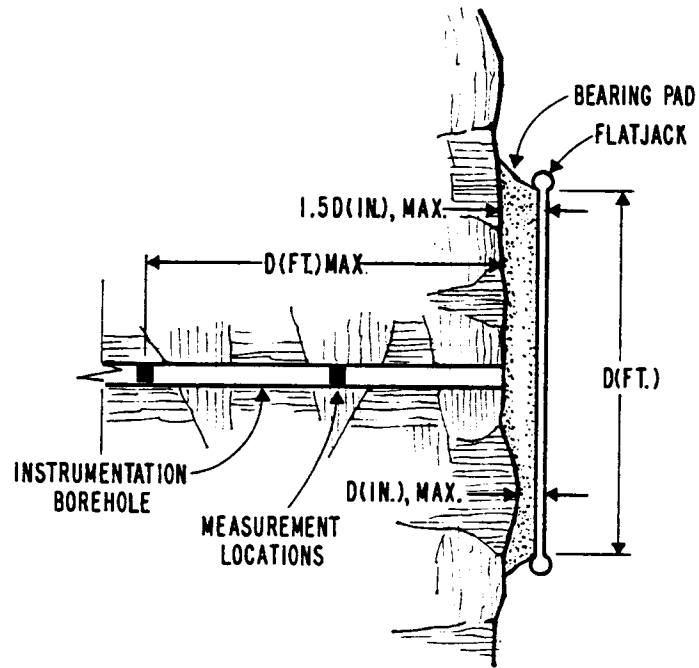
ALLOWABLE DIMENSIONS FOR ROCK SURFACE AND BEARING PAD, FLEXIBLE PLATE LOADING TEST
